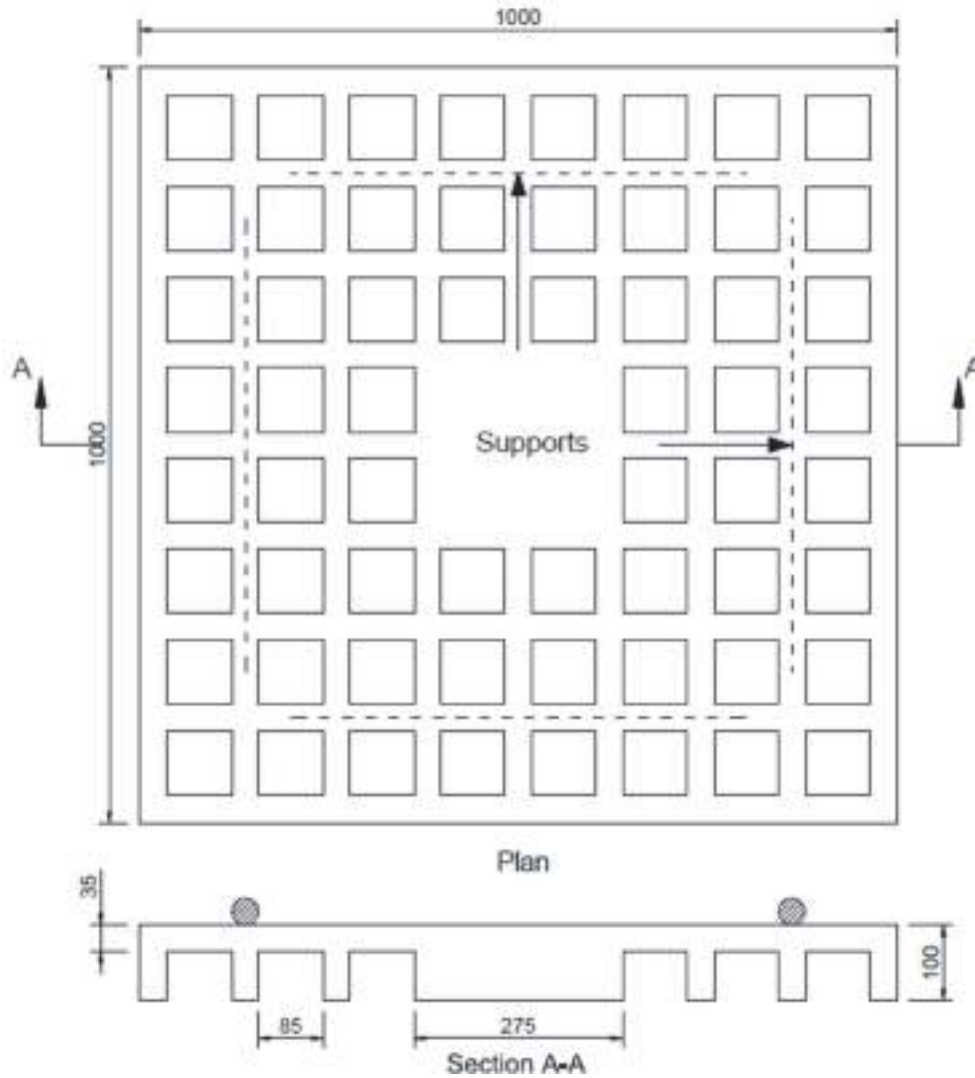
4 Geometry of waffle slab specimen IWS1.
